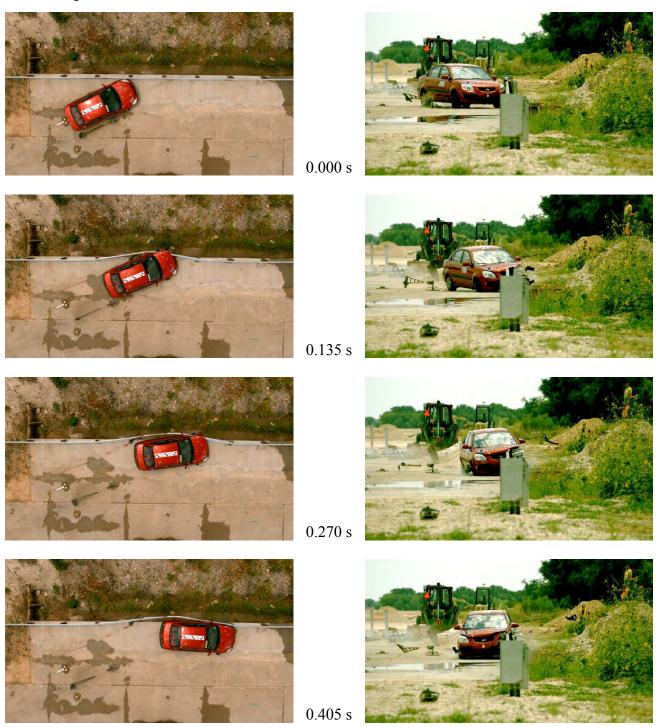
Sequential Photographs for Test No. 490023-6-2 (Overhead and Frontal Views).
